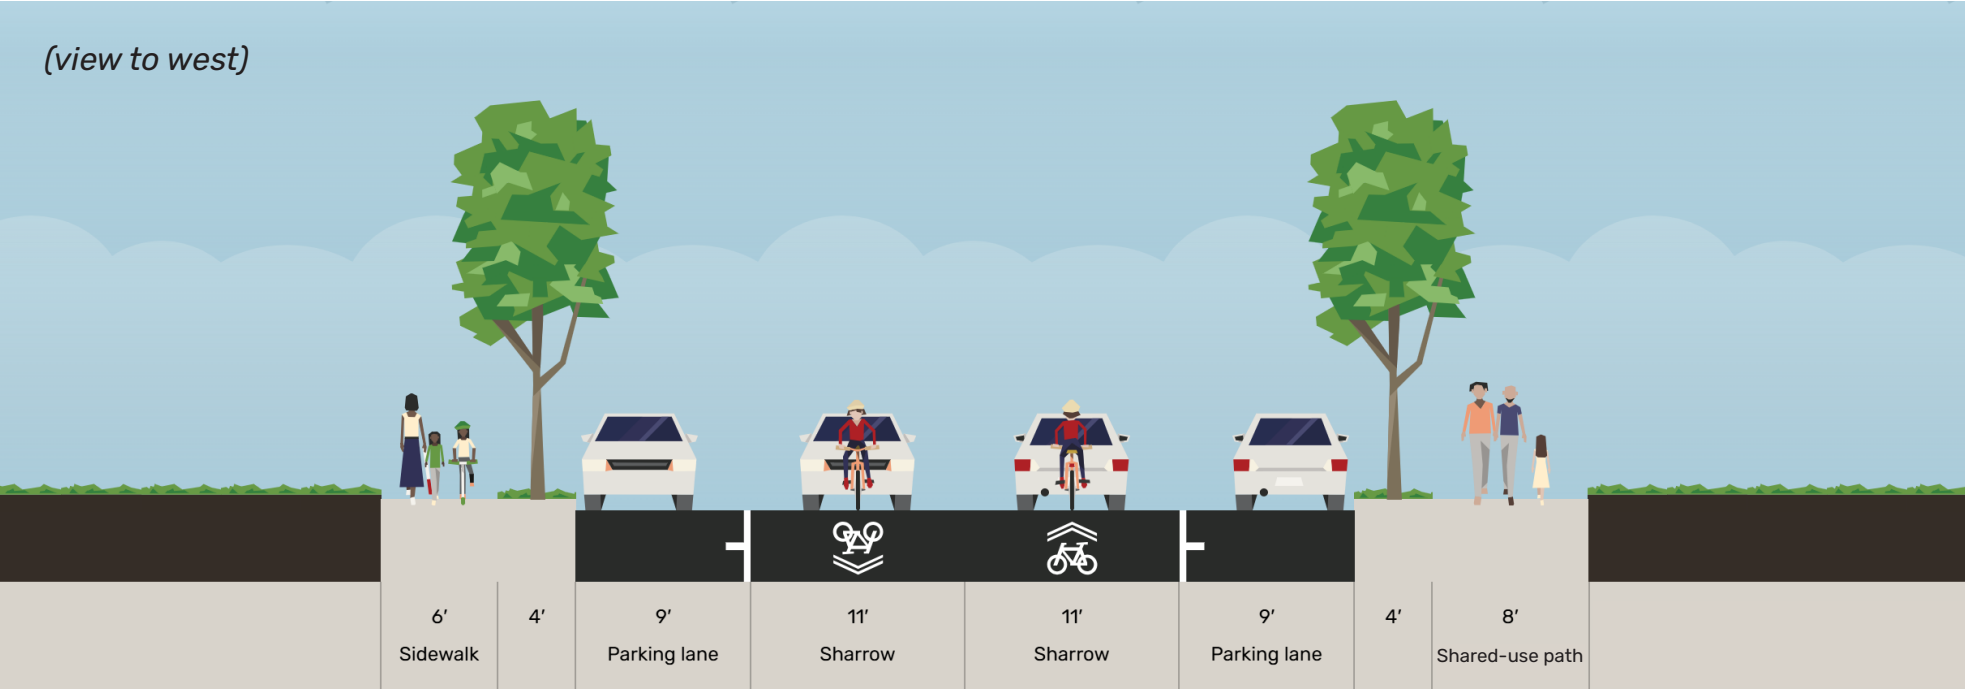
Proposed Typical Cross-Section on Meadowview Drive (62’ ROW)
